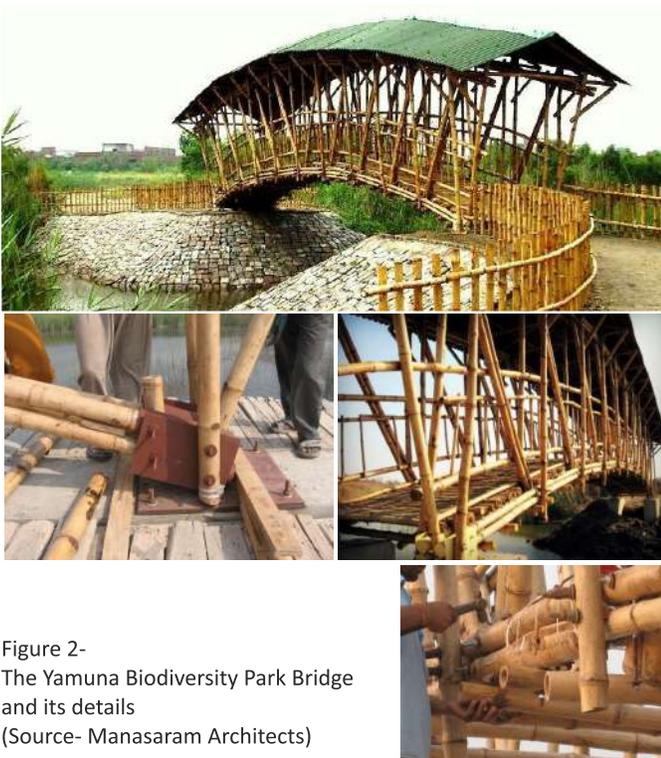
The Yamuna Biodiversity Park Bridge and its details (Source- Manasaram Architects)
